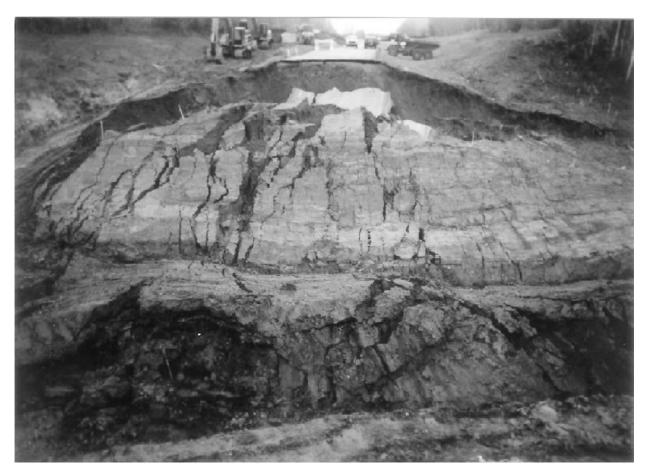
Excavation Slope Failure, Hwy 88 Culvert Replacement Project
